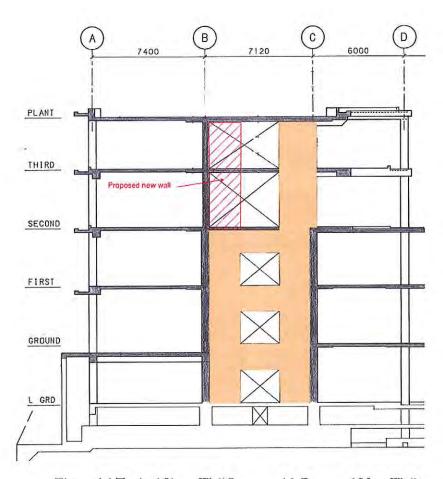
Typical Shear Wall Layout with Proposed New Wall.
